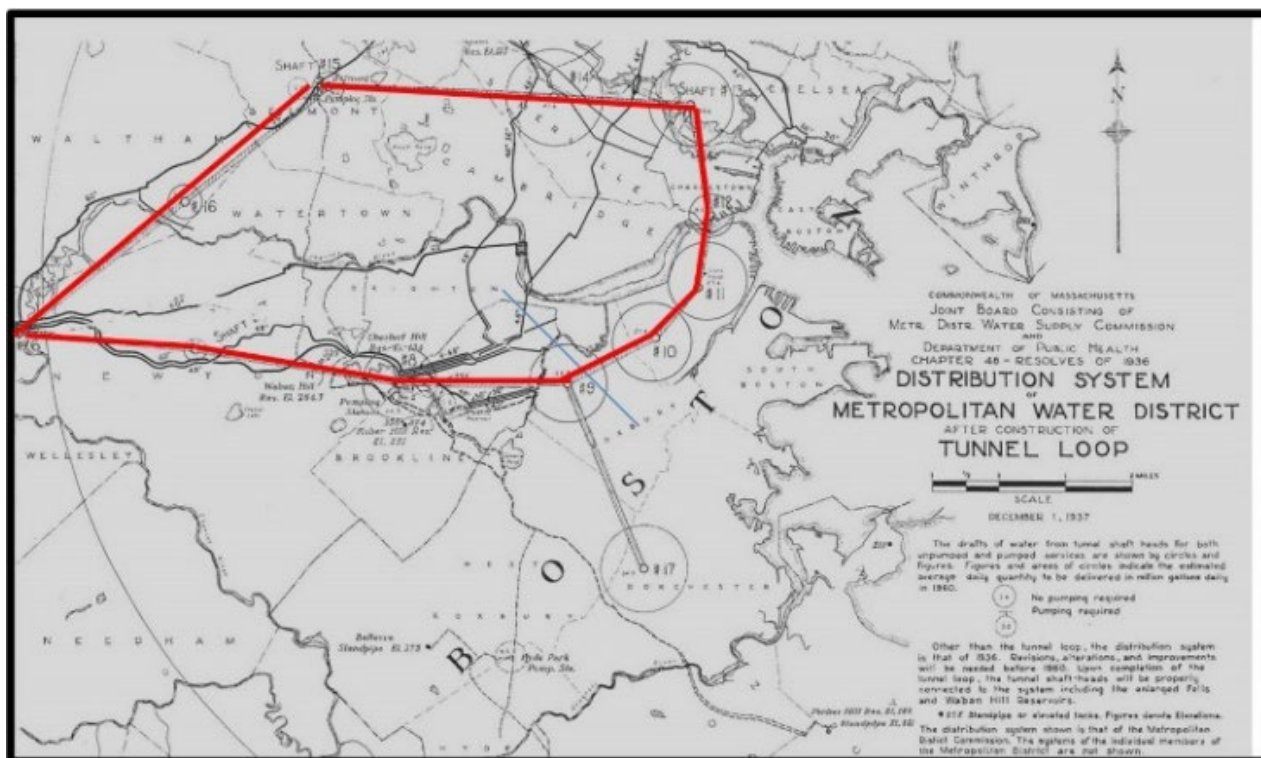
Proposed Metropolitan Water District Tunnel Loop plans, the red line highlights the proposed tunnel loop (MWRA collection).
